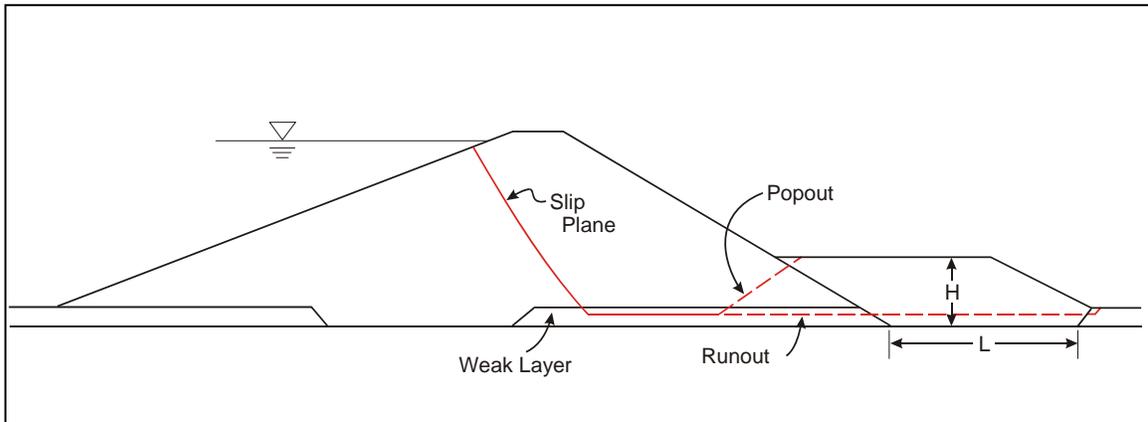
TYPICAL PROPOSED MODIFICATION SECTION
